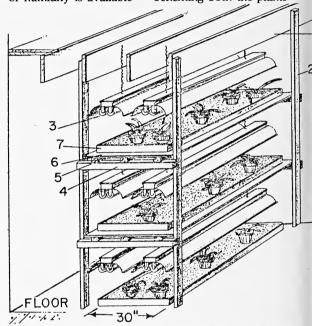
PLAN FOR BASEMENT LIGHT GARDEN: Cross-sectional sketch of a plant growth area as developed in a basement. Plant growing areas are tiered three-high. Each section is 4 feet long and illuminated by 4-foot fluorescent tubes in reflector fixtures, 2 tubes per fixture. Construction consists of H-type frames resting on the floor and attached to the joists (No. 1) Uprights (No. 2) are 2 x 4's; cross bars (No. 4) are also 2 x 4's. Longitudinal supports (No. 5) are made of 2 x 2's on which rest 34-inch plywood platforms (No. 6). (Note. Plywood should be exterior type.) Metal trays (No. 7), with turned up sides and filled with gravel, rest on the plywood platforms and serve as the actual method of supporting the plants. Such units can be attached end-to-end in a series. Fixtures with lamps hang on chains for height adjustment. Fixture reflectors (No. 3) are 12 inches wide. The width of the bed is about 30 Inches.
